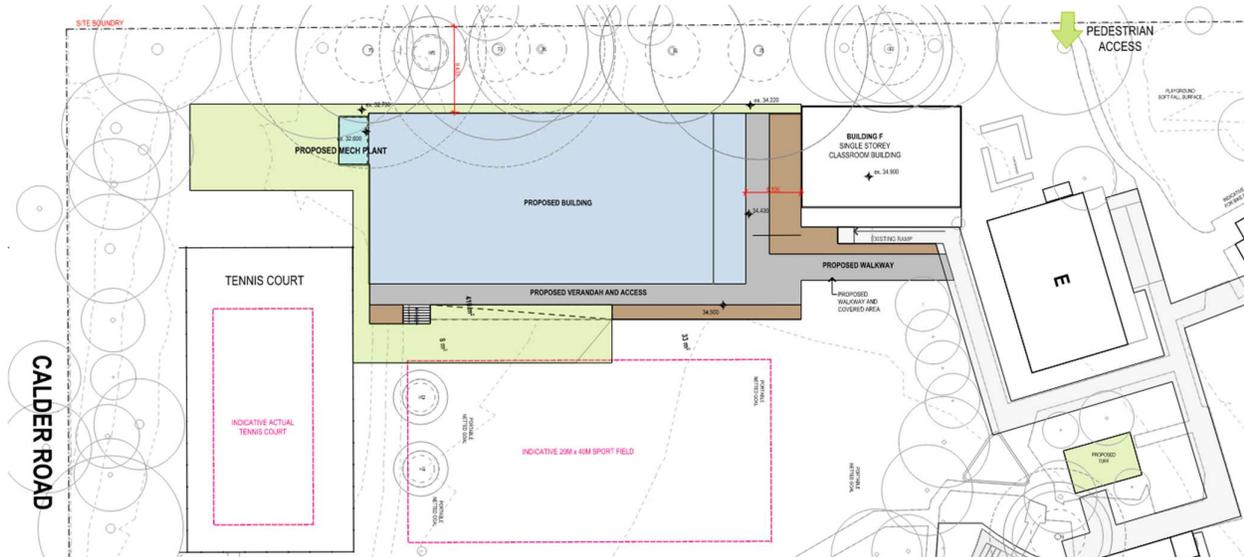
Proposed 100% Schematic Plan for Dundas Public School – Fulton Trotter Architects
